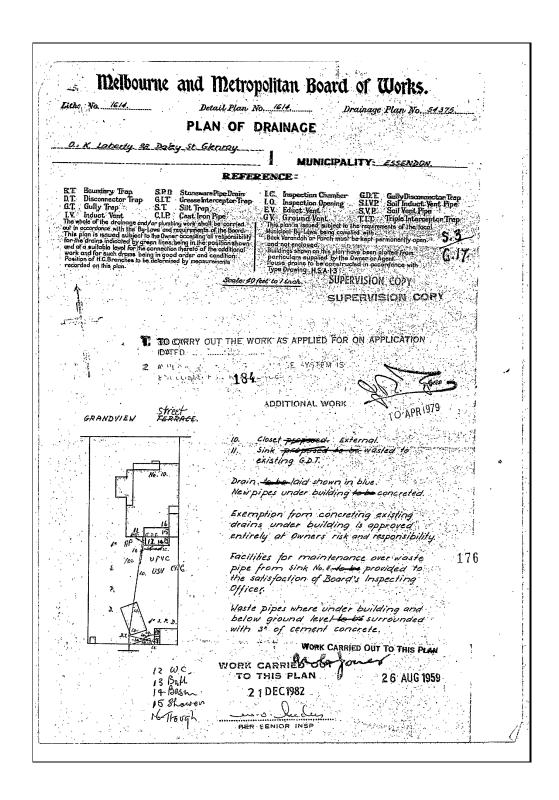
MMBW Property Drainage Plan No.54375 (dated 1959-1982) showing the footprint of the dwelling at 10 Grandview Street at that time. Source: Casey Inspection Services.
